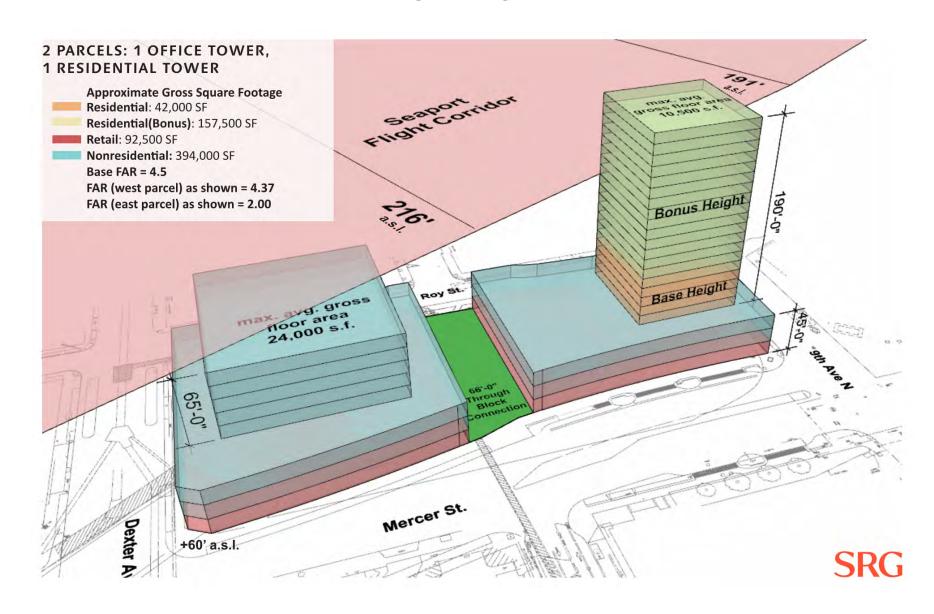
Potential Building Envelope with Existing Zoning (Residential)
